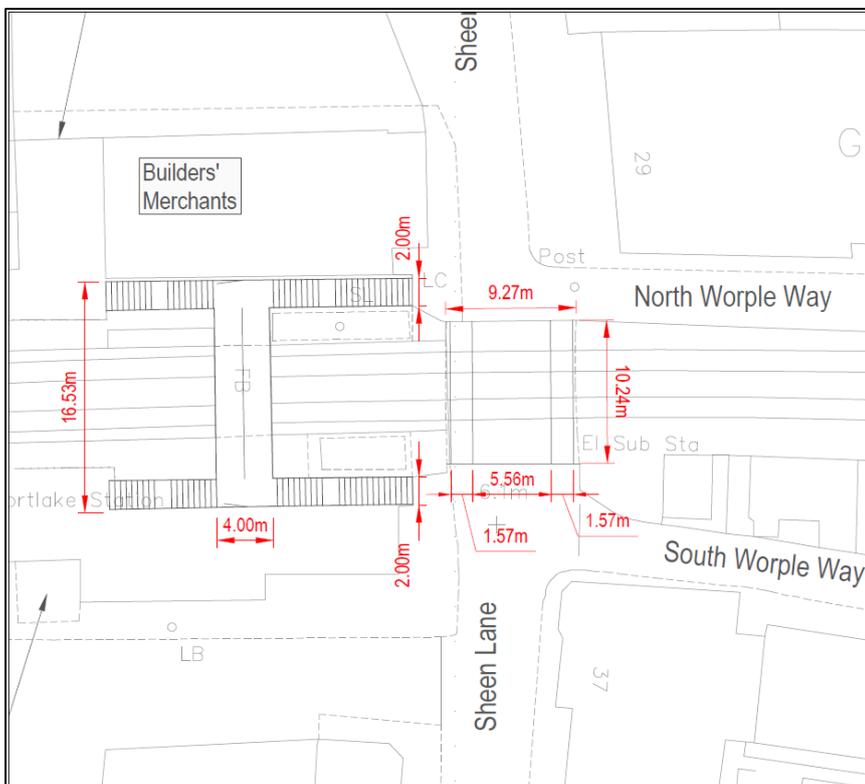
Dimensions of Sheen Lane Level Crossing and Footbridge
